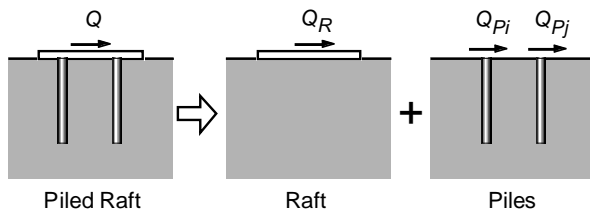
Decomposition of Piled Raft Foundation under Horizontal Loading
